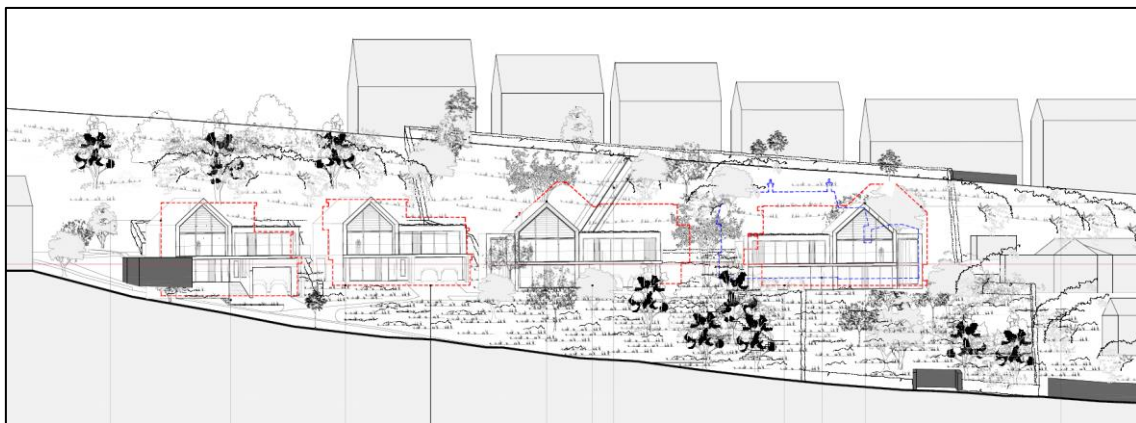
Proposed street scene (existing house in blue, previous scheme in red)
